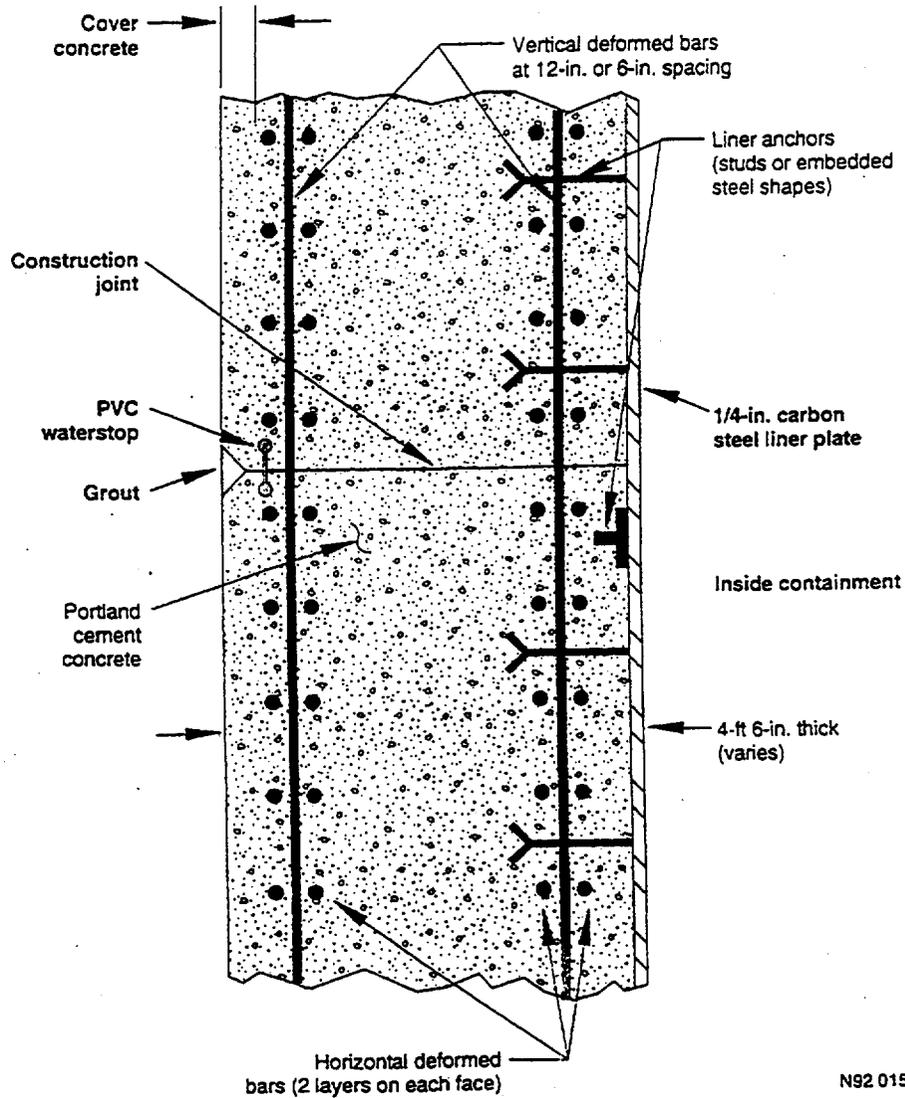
Typical PWR reinforced concrete containment wall section.
